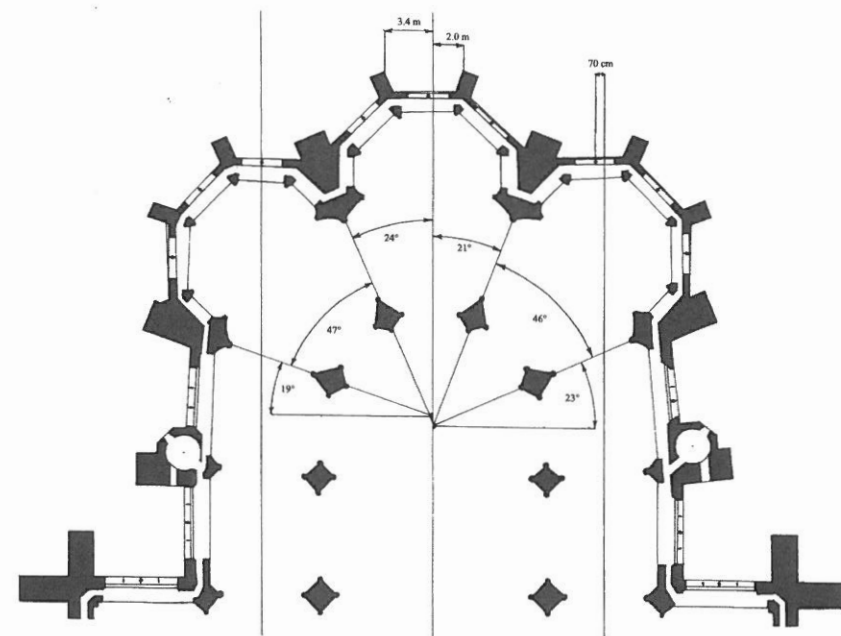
Metz Cathedral: choir plan with distortions noted.
